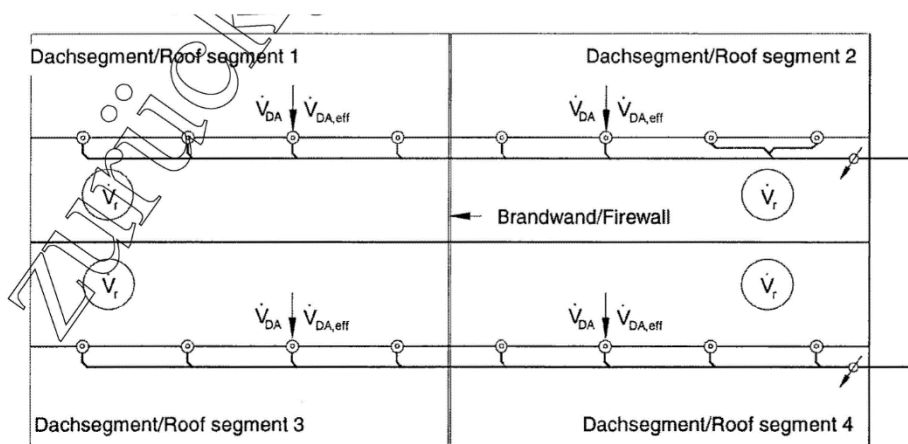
Definitions of "nominal drainage" and "actual drainage" from a roof surface or roof segment
